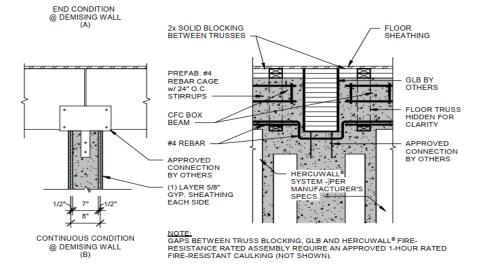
1-hr Beam Penetration of Load-Bearing CFC Box Beam Wall
